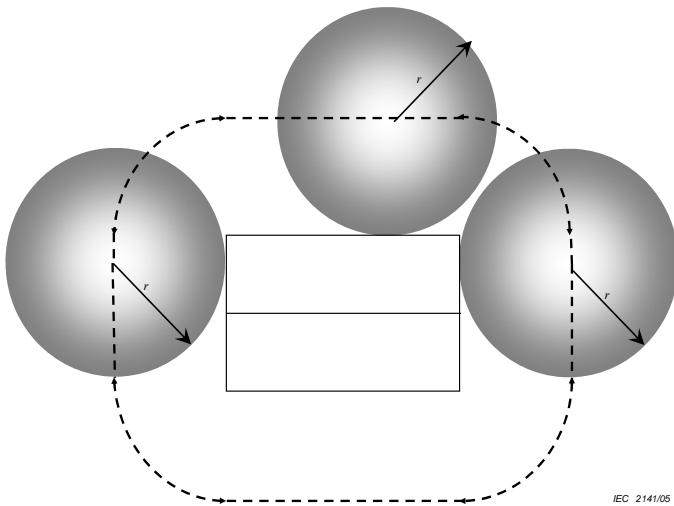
Structure to be protected with rolling spheres (radius  $r$ ) – plan view [2].
